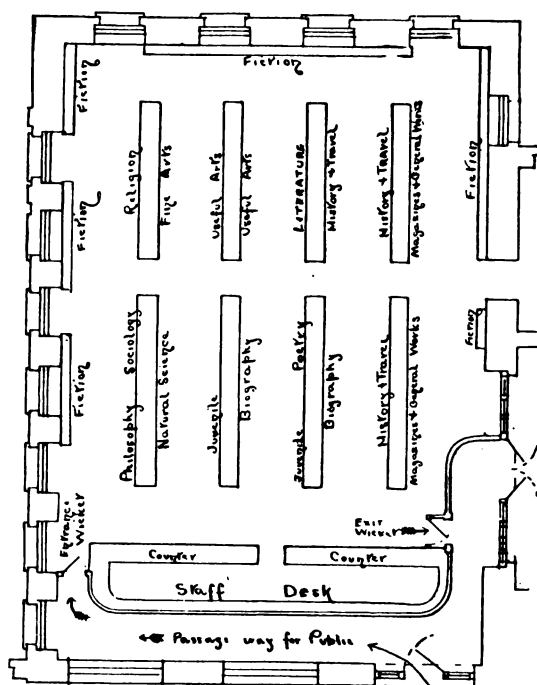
Plan of the lending department, Central Library, Croydon.
